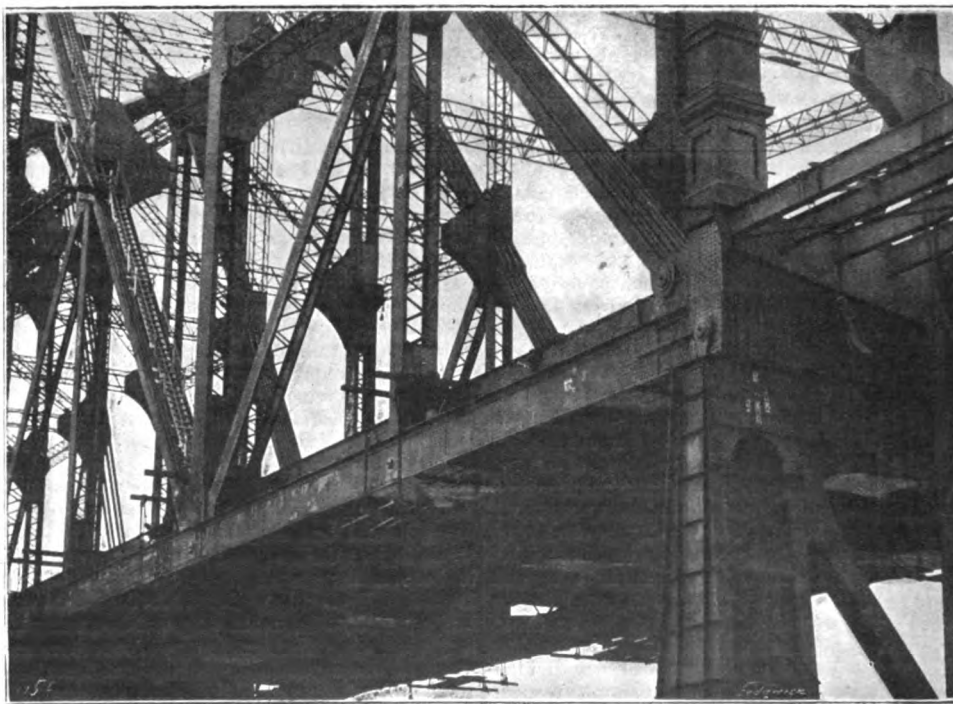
BRACING OF SOUTH ANCHOR-ARM.
